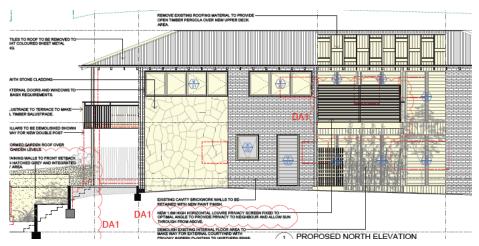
Approved north elevation (with condition 8ii, increasing sill height of W21 and W22) (source: Castlespeake)
